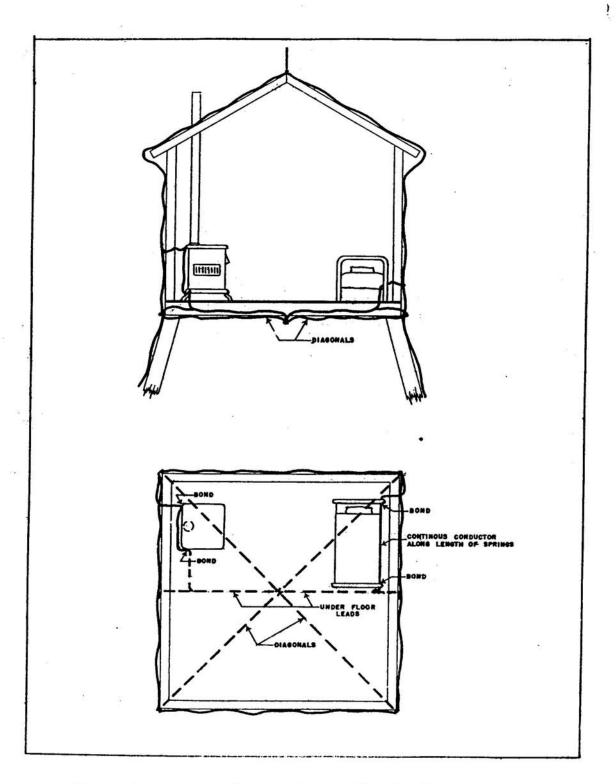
Typical layout of grounding for bed and stove (corner location).
